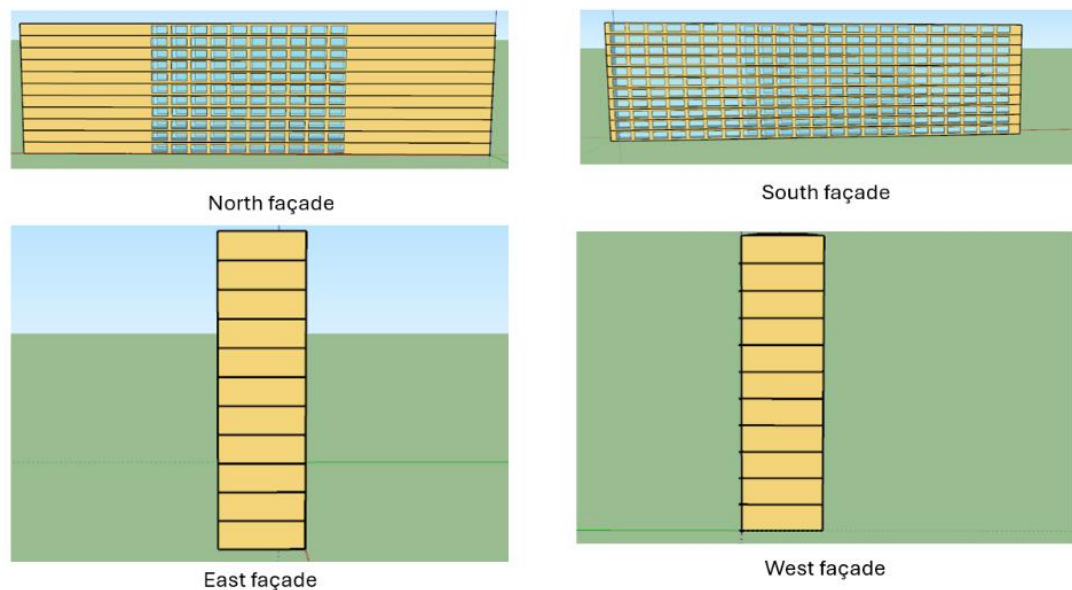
Facades of the reference building second building archetype (2011 residential building) for the Copenhagen district.
